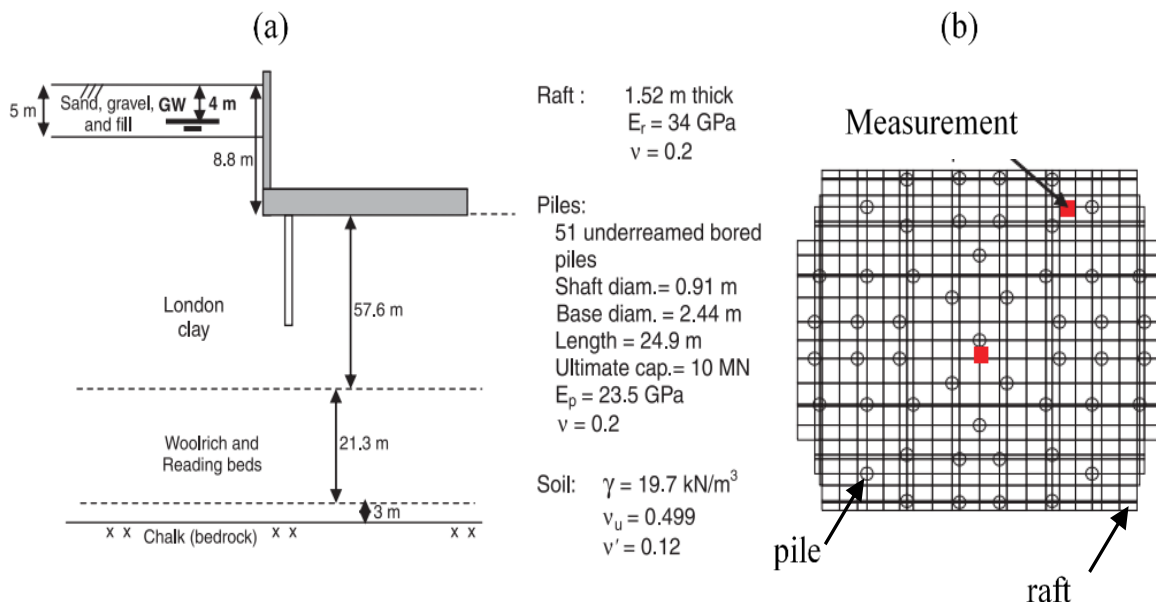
Hyde Park Barracks Foundation Details (Hooper 1973)
